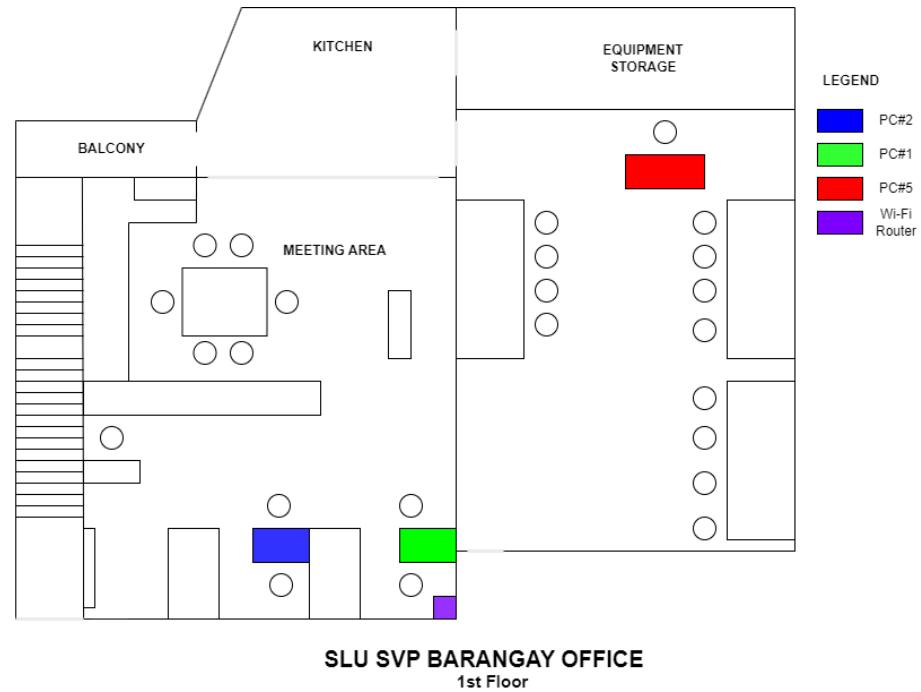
SLU SVP Barangay Office Floor Plan 1st Floor
